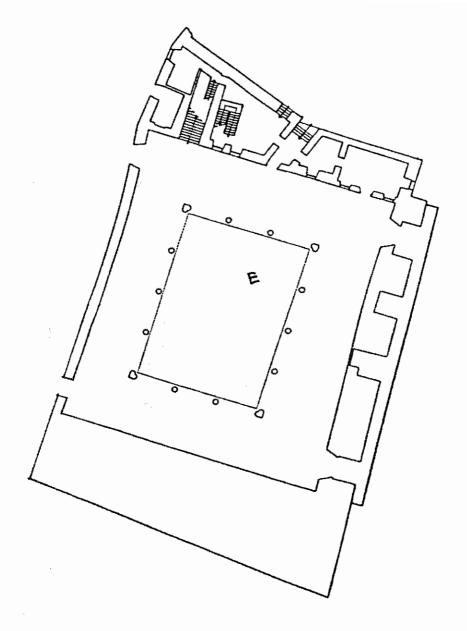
Giulio Cesare's New Houses plan (detail of fig. 1 above)
